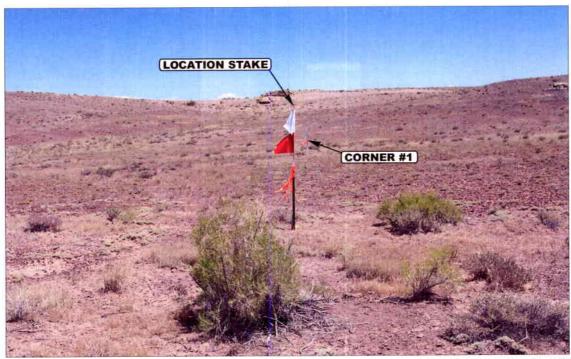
PHOTO: VIEW FROM LOCATION STAKE TO CORNER #1
